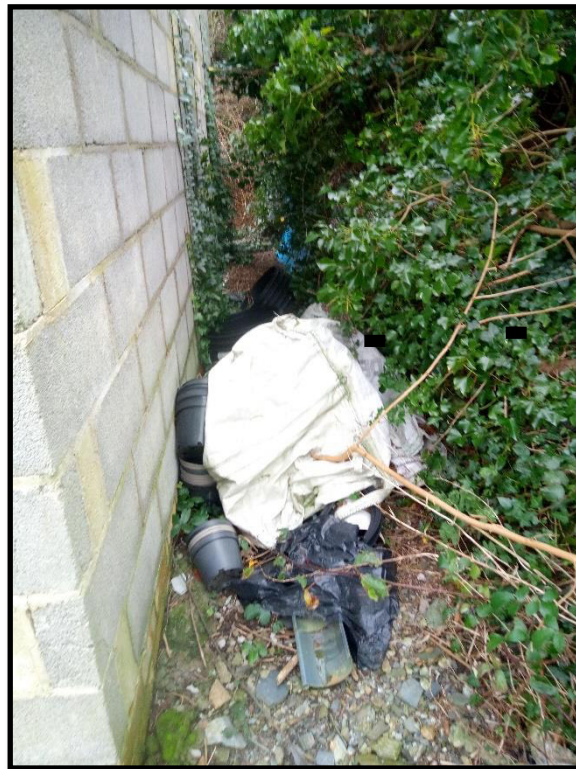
View from the southeast corner of the site looking west towards the existing garage.
